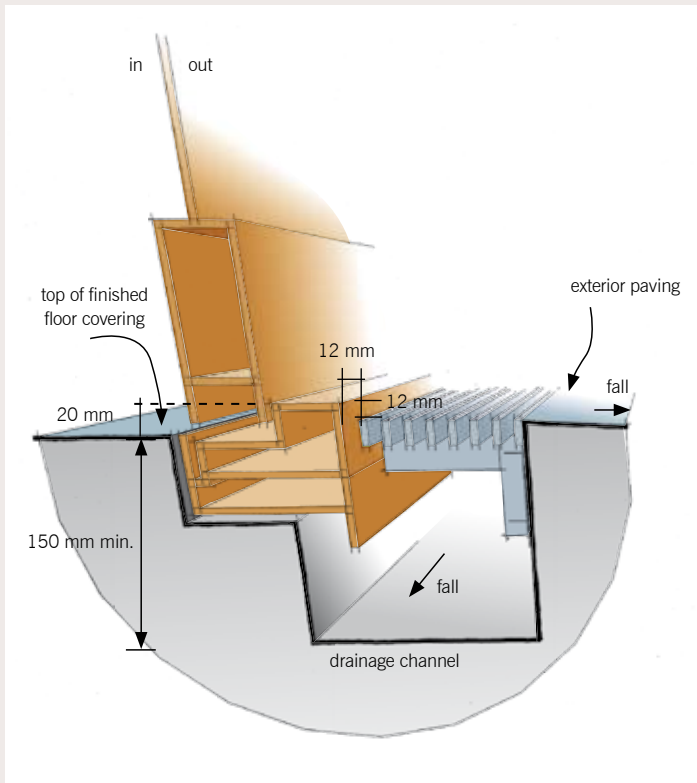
(a): Section through door for concrete floor slab, details for inward opening door.
